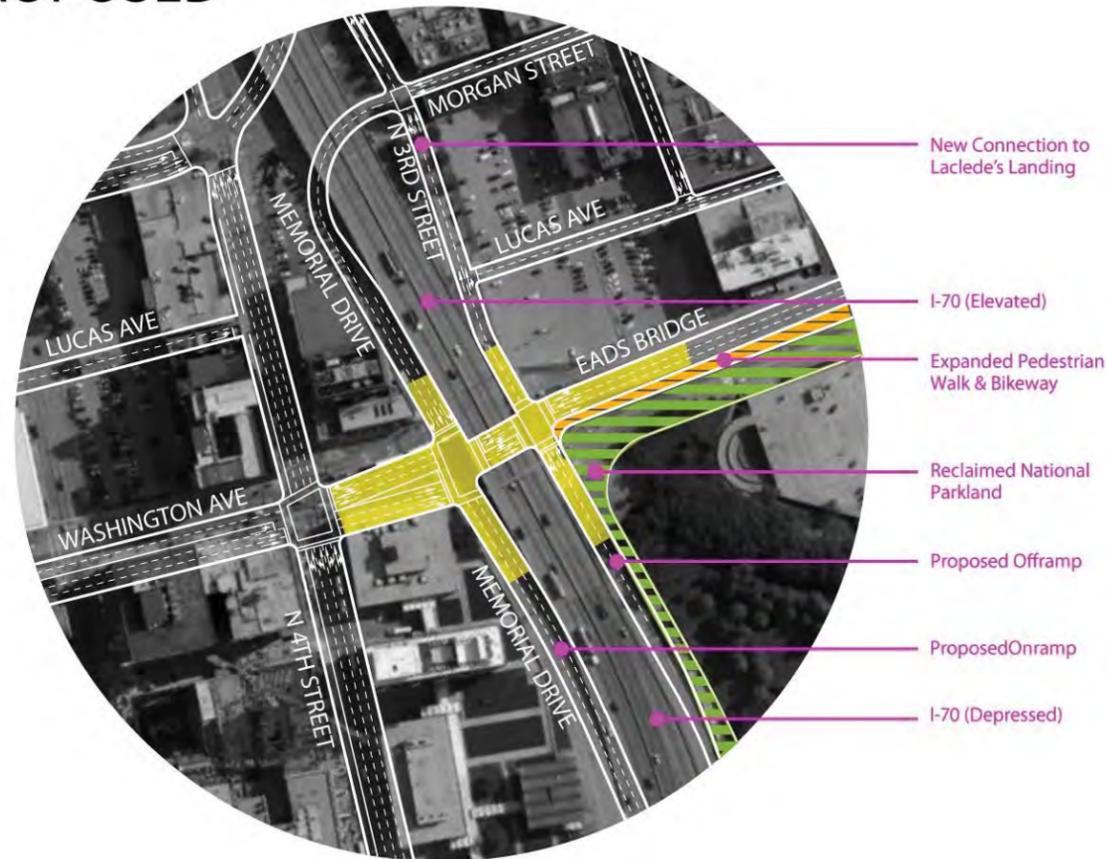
Proposed Washington Avenue Removal and I-70 Ramp Configuration
